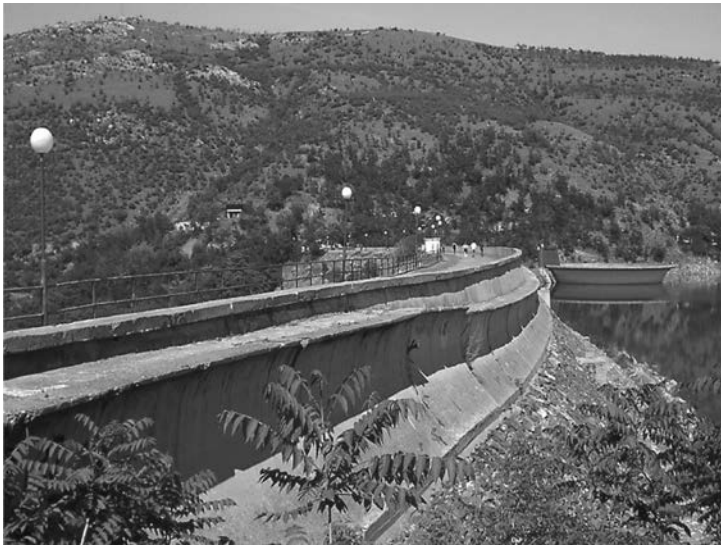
Tikvesh dam crest today, with both new and deformed old crest parapet wall.
